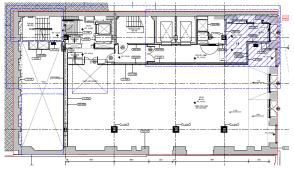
Beneficial House—Floor Plan, George Street level—showing proposed new stair and lift. (Source: Make + Architectus A-285-11-04-0, 17 April 2019, similar to DA 2005 set issued 14 February 2017)
